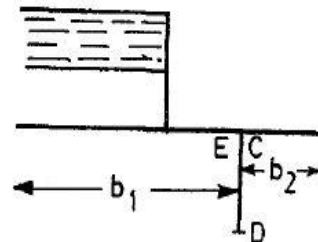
d. A straight horizontal floor having sheet pile at middle position
